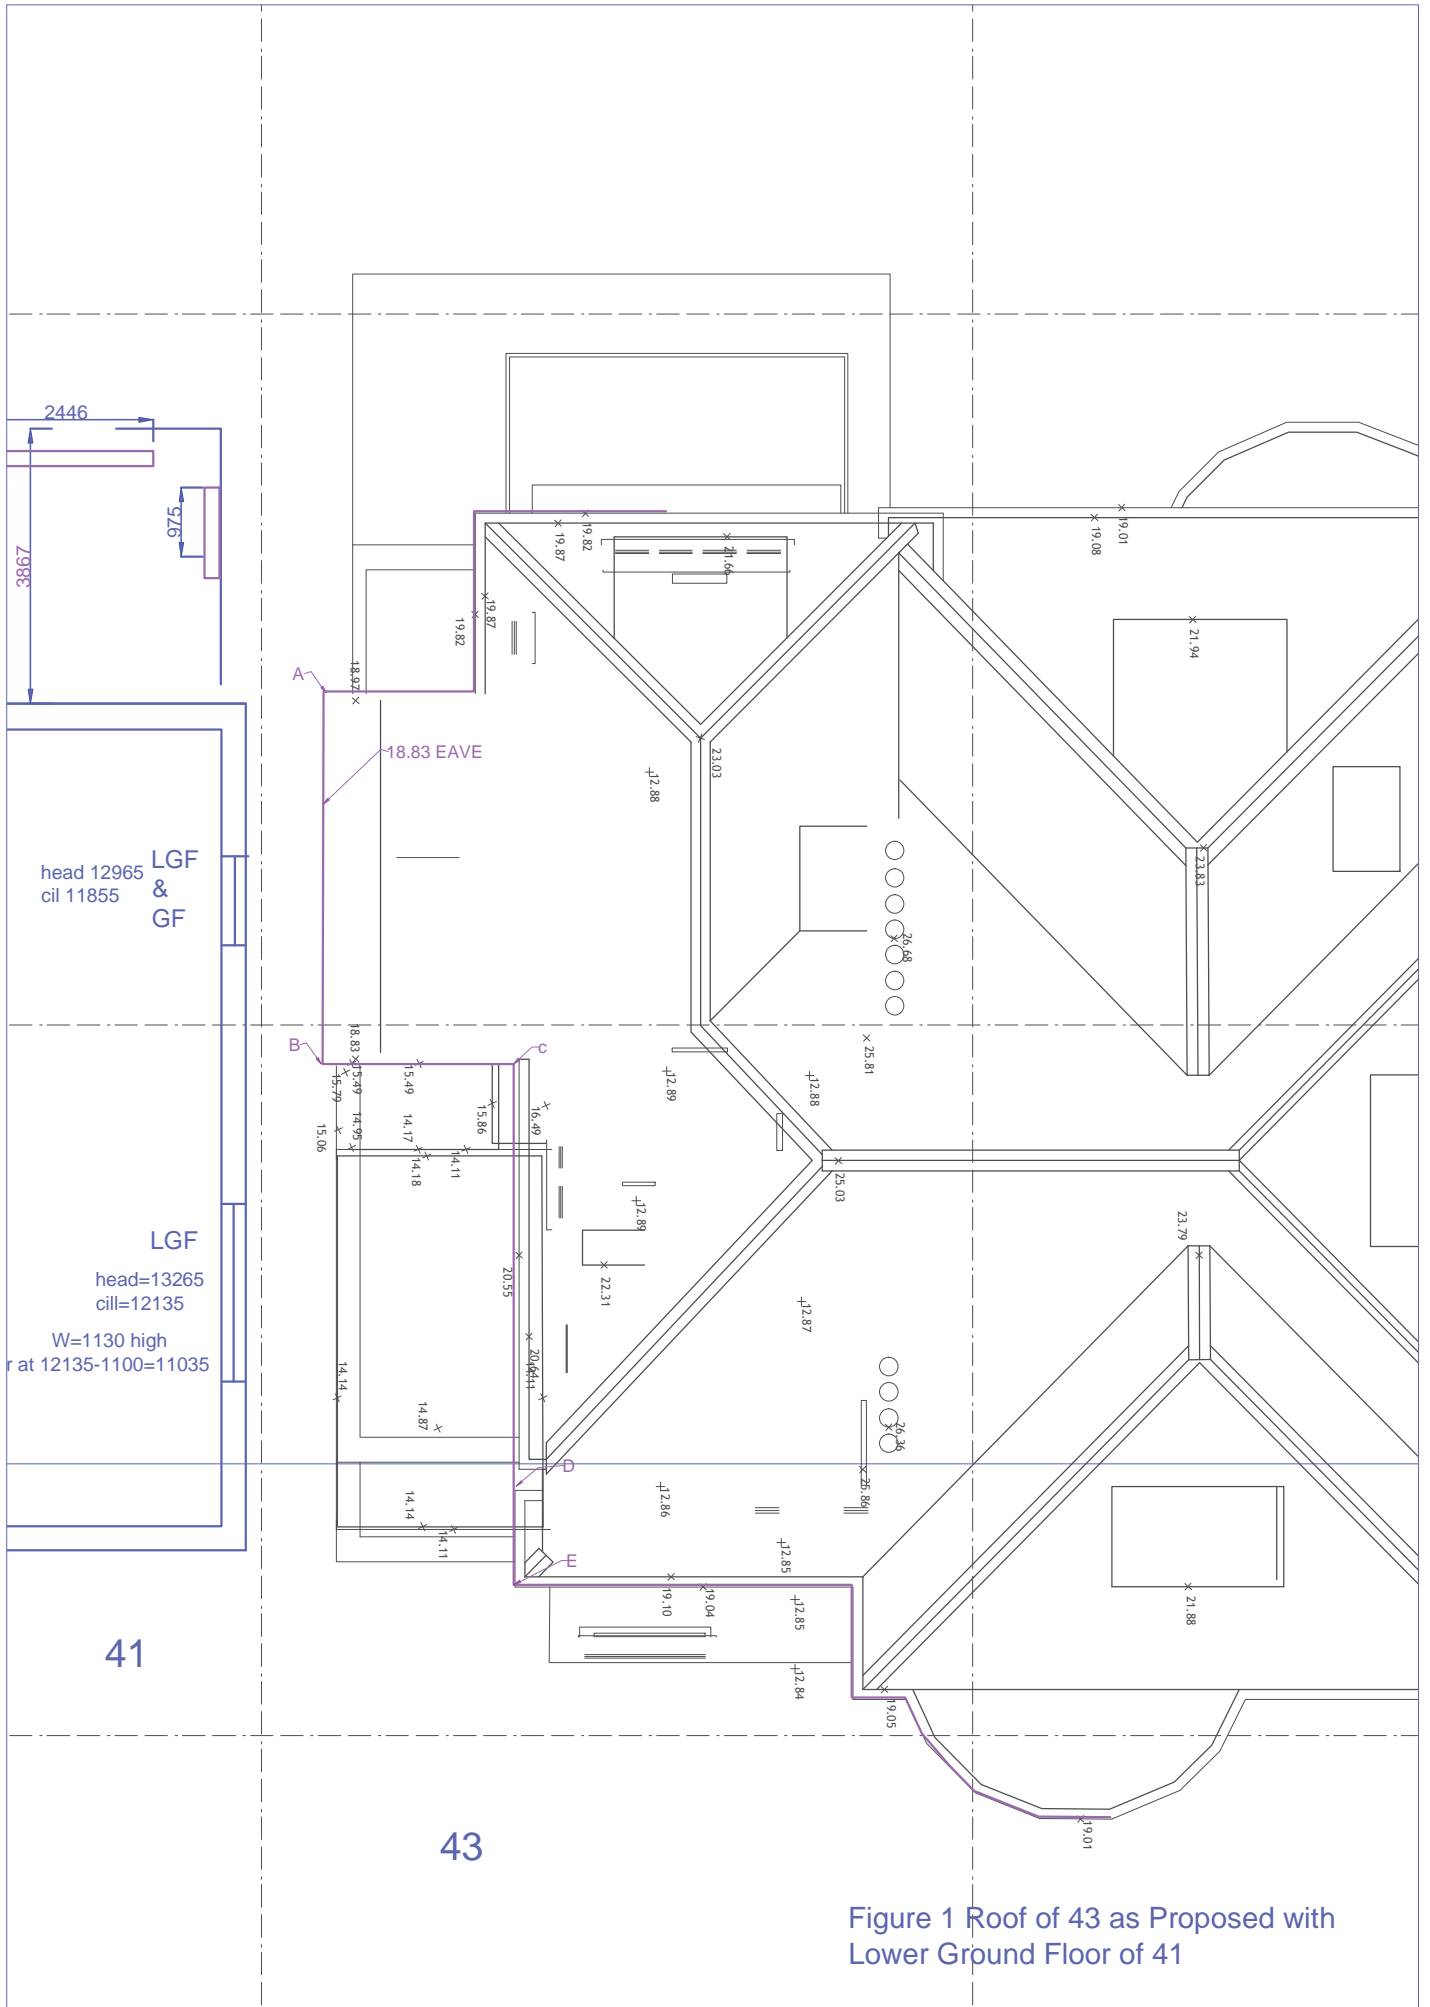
Roof of 43 as Proposed with Lower Ground Floor of 41
